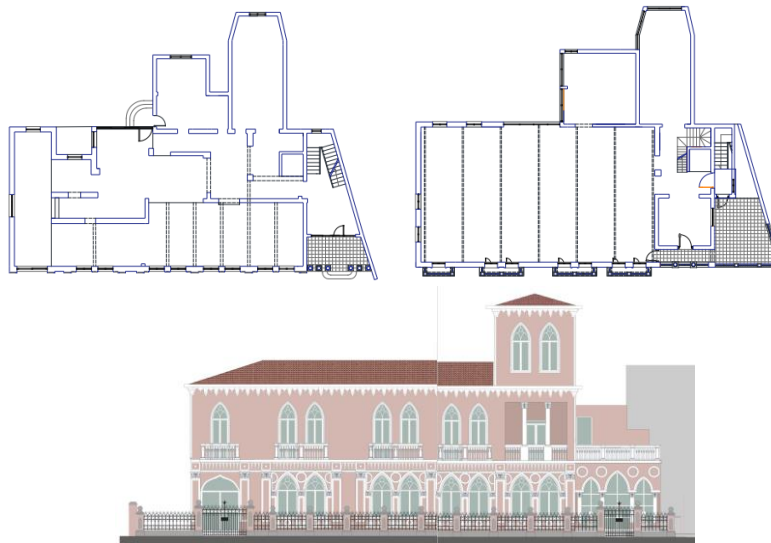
Ground floor, first floor plan and main façade of the former Yugoslavian Embassy, from 2022 survey (Source: author)
